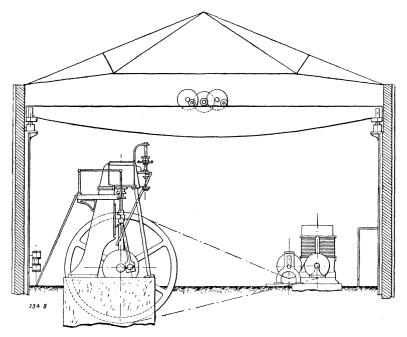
Transverse Section through Engine Room, City and South London Railway.
